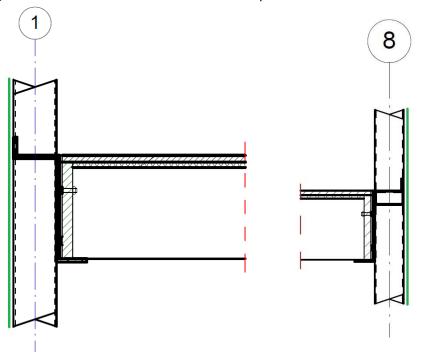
Detail 1, 1:10 (Adapted from: IMd Raadgevende Ingenieurs)
